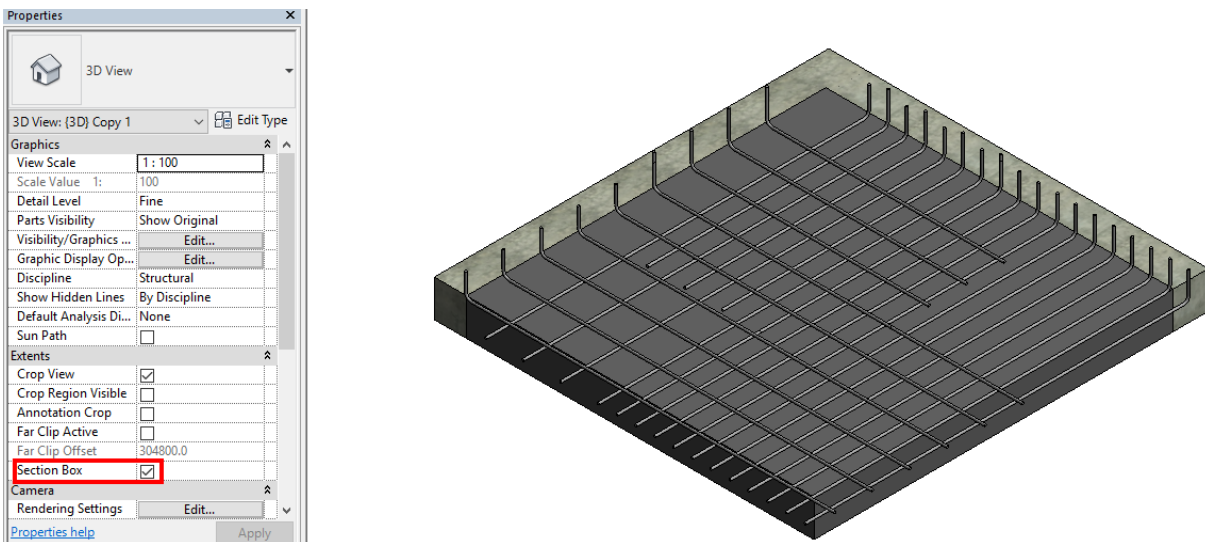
Area section view of a lower surface corner reinforcement zone
